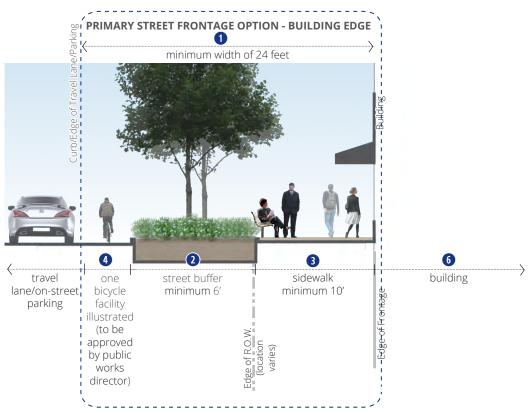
Primary Street Frontage Option - Building Edge
